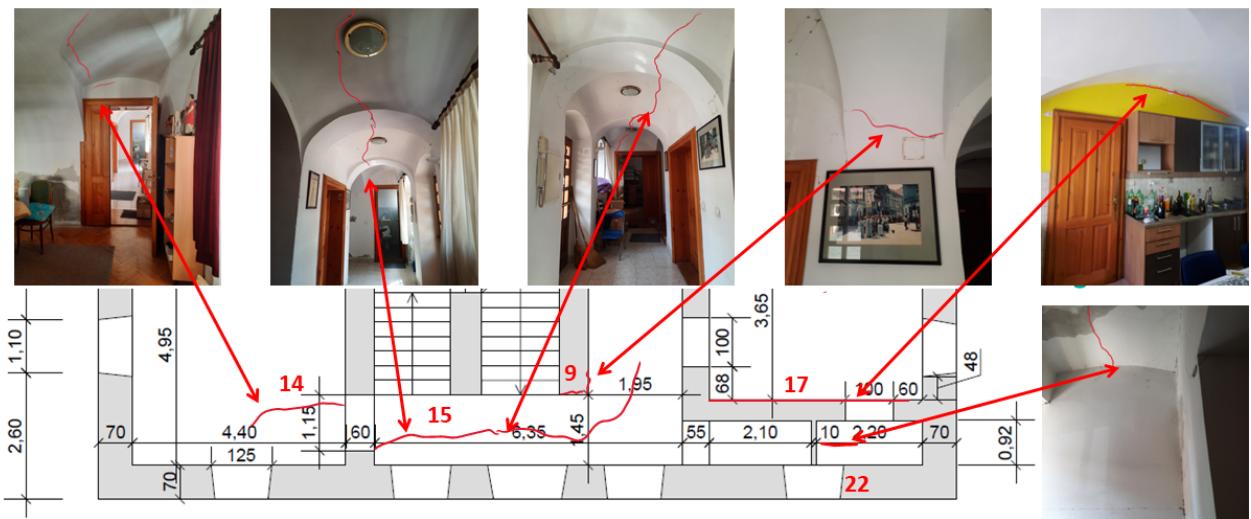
OOP mechanism west facade: Relevant cracks that indicate the mechanism, ground-floor
